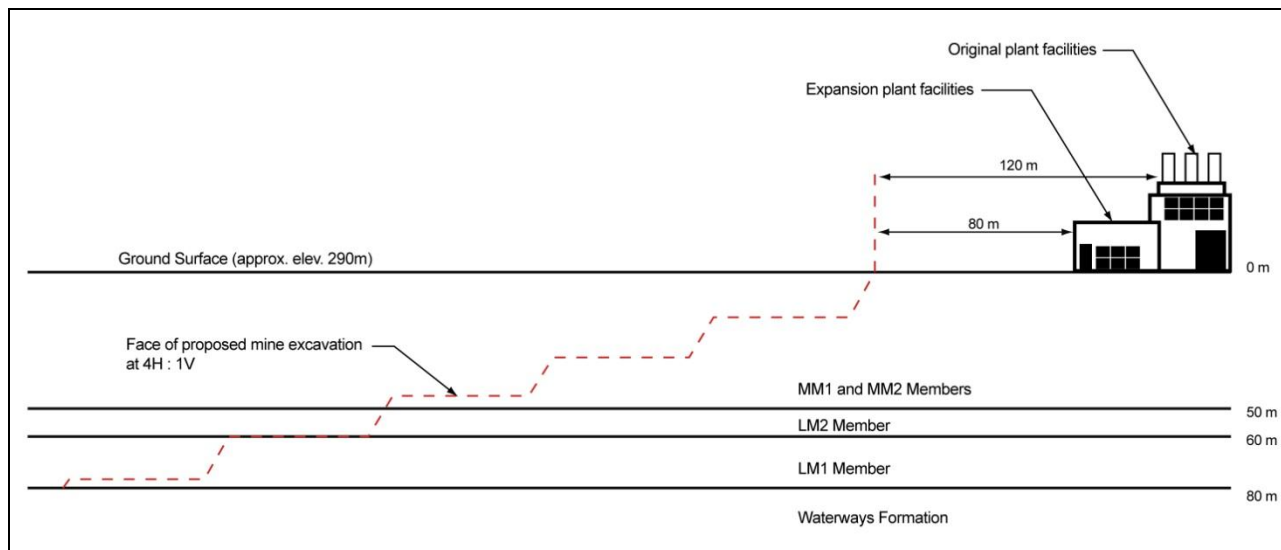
Schematic Cross-Section Of Plant Site and Mine Pit Slope Area
